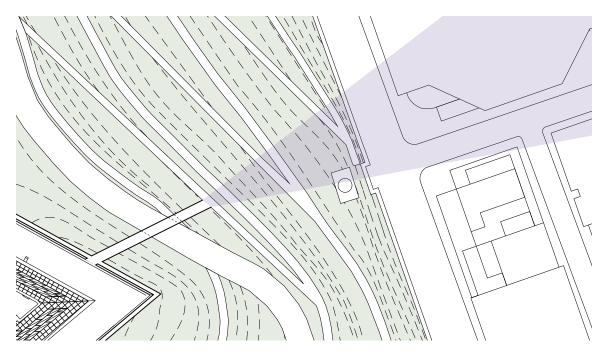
Plan section diagram of a pedestrian tunnel connecting the Fort George Ditch with the glacis - its entry point lands at the B1 - B4 Protected Viewplanes viewing location.
